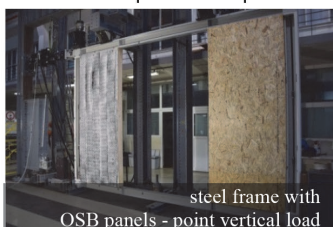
Some examples of various possible boundary conditions of timber shear wall experiments, Photo: Slovenian National Building and Civil Engineering Institute (ZAG Ljubljana)
